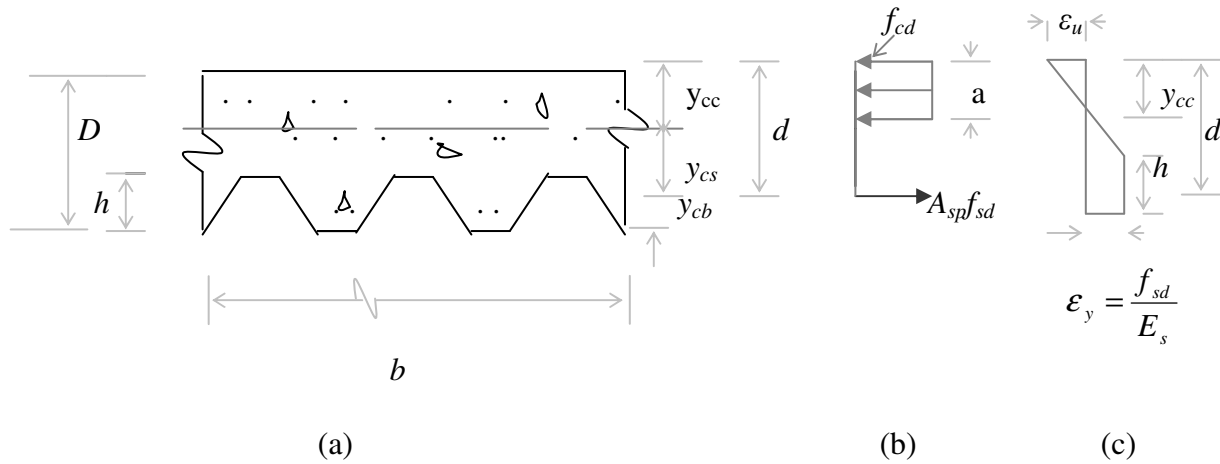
(a) Cross-section of profiled steel sheet and concrete composite slab
